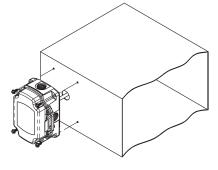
BAPI-Box (BB) Enclosure Mounting and installation Holes (Rotate 90° for Horizontal Mounting)
